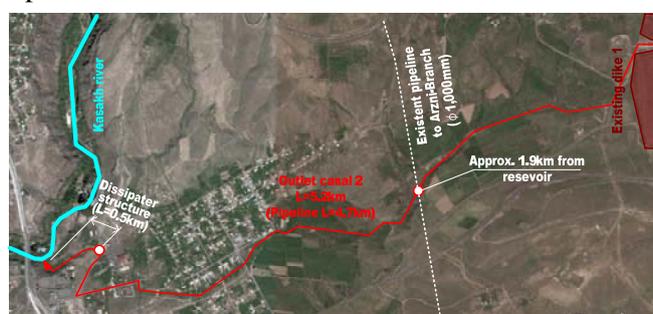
Alignment of Outlet Canal 2 till Kasakh River
